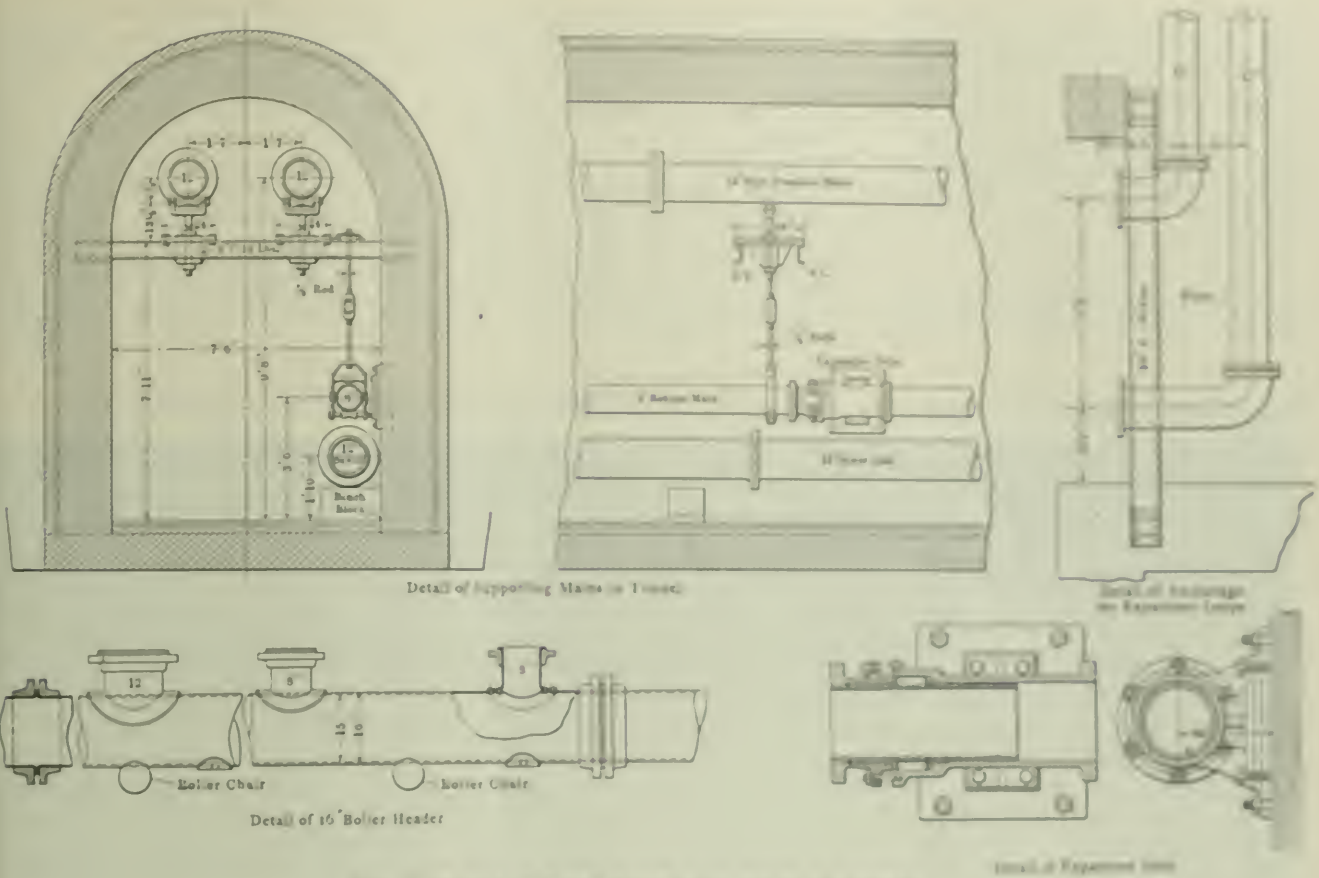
DETAILS OF BOILER HEADER AND PIPING IN TUNNEL
